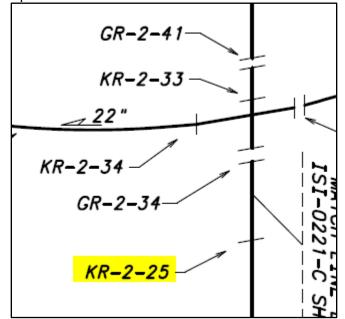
Weld KR-2-25 (Extracted from Reference Drawing 2-ISI-0270-C-02)
